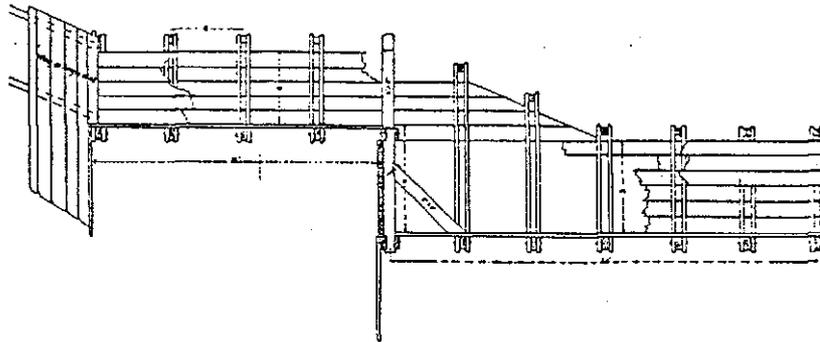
Arizona canal cross-cut. Cross sections of fall.
